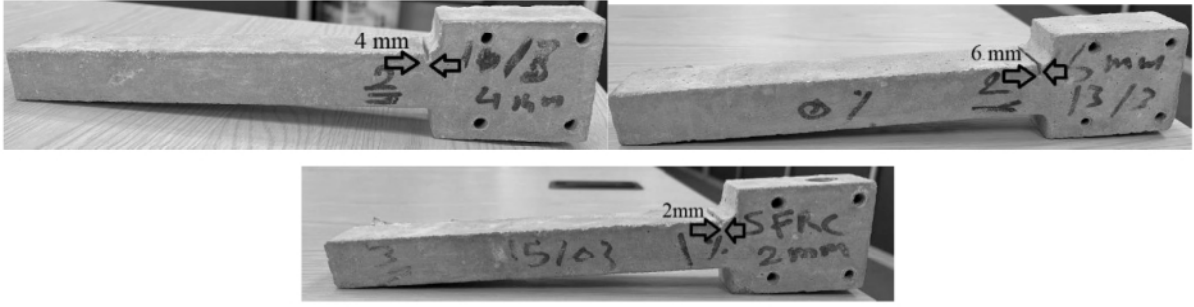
Illustrates a seeded crack depth ranging from 2 mm to 6 mm of an SFRC beam.
